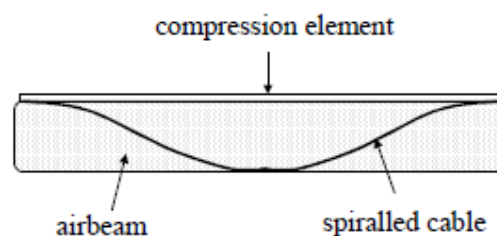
Tensairity beam. R.H. Luchsinger 2004
